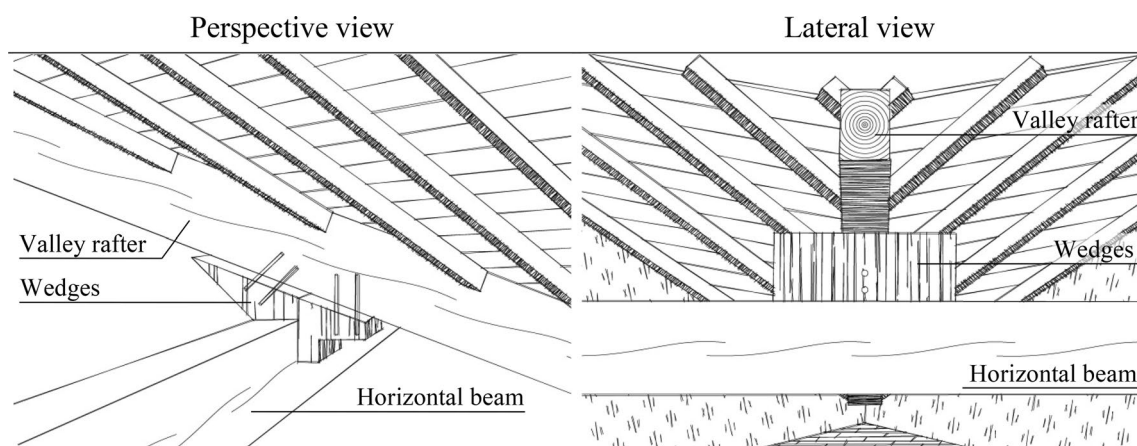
Substitution of the failed horizontal beam and enhancement of the compressive contact area with the valley rafter
